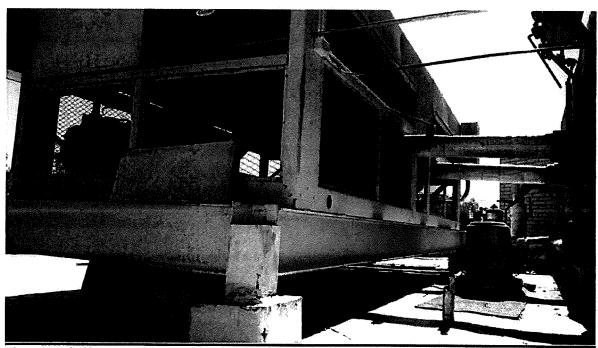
Existing chiller looking in opposite direction of Photo 1. Expansion tank racked on wall can be seen to the right.
